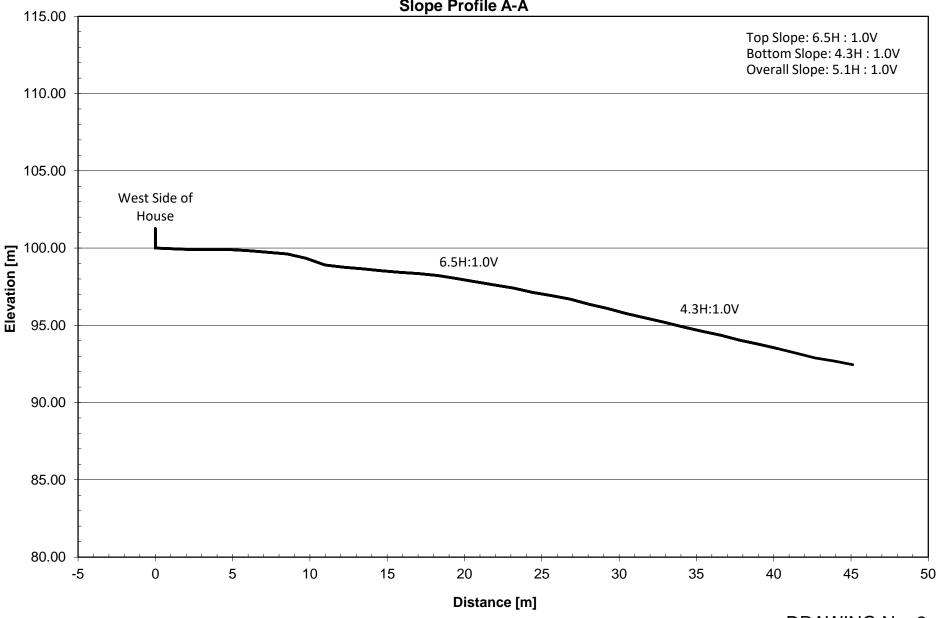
and 3, Slope Profile A-A, Slope Profile B-B
